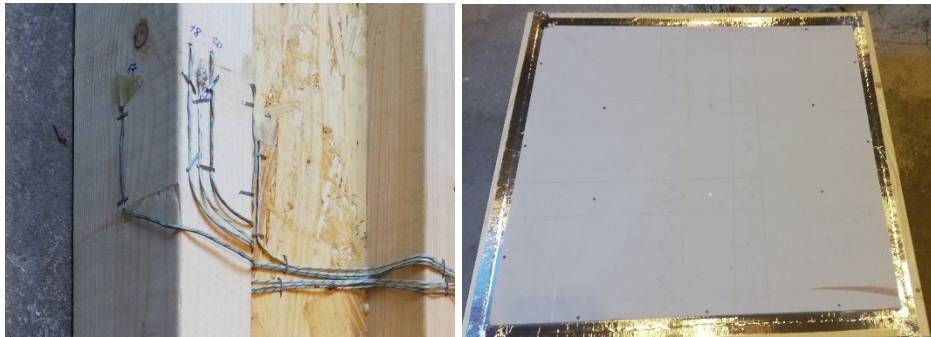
Thermocouples on the fire exposed flange (left) and the finished specimen (right).
